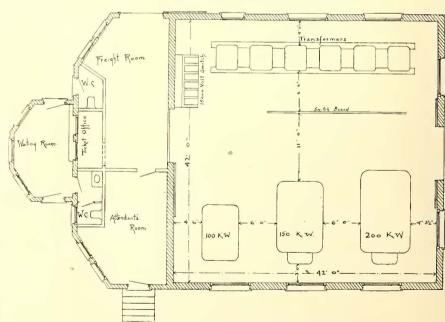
PLAN OF BELVIDERE SUB-STATION
